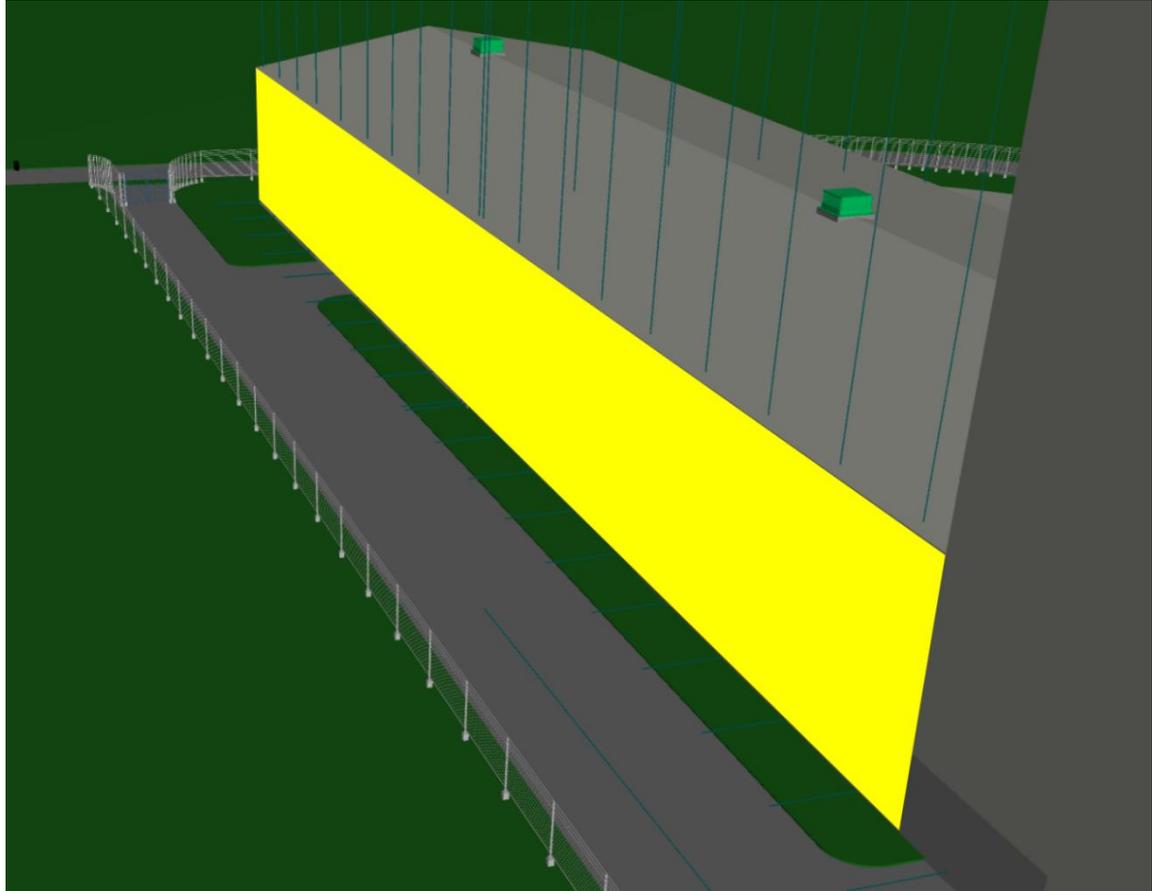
Fuel Handling and Bunker Building (UEA, UEB) South Elevation
